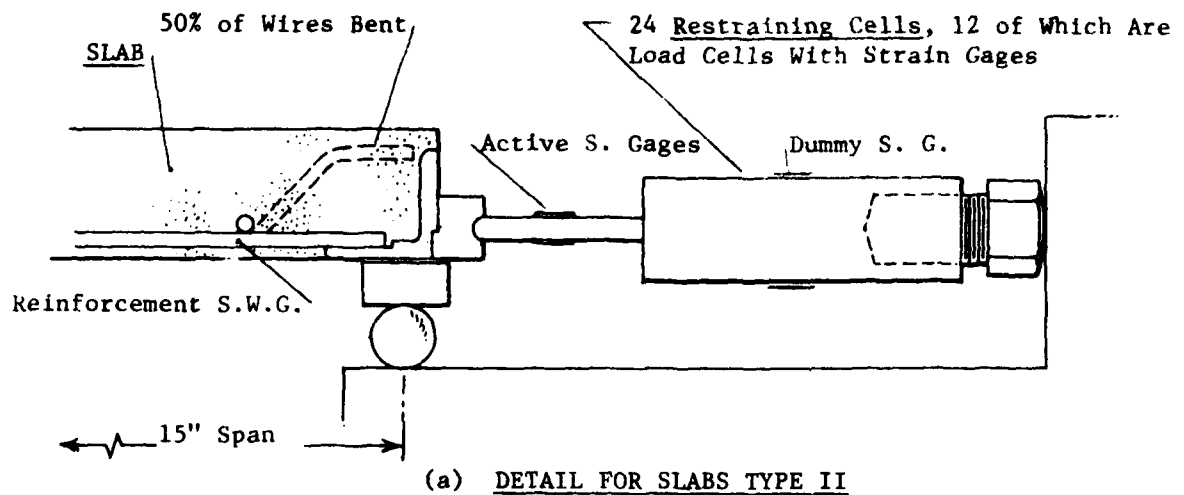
SLAB SPECIMENS - EDGE DETAILS
